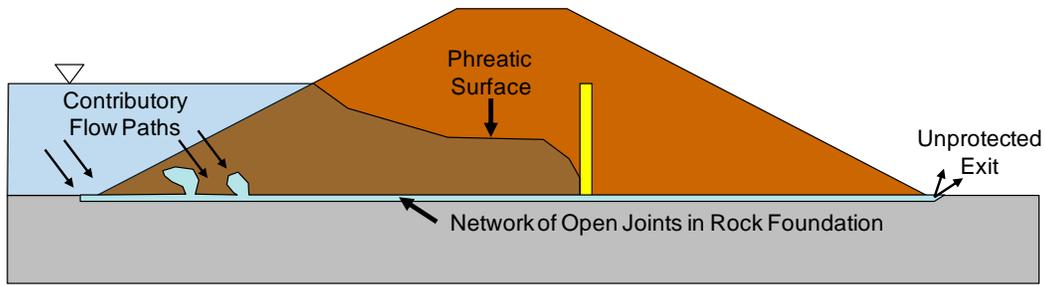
Internal Erosion along the Embankment-Foundation Contact
